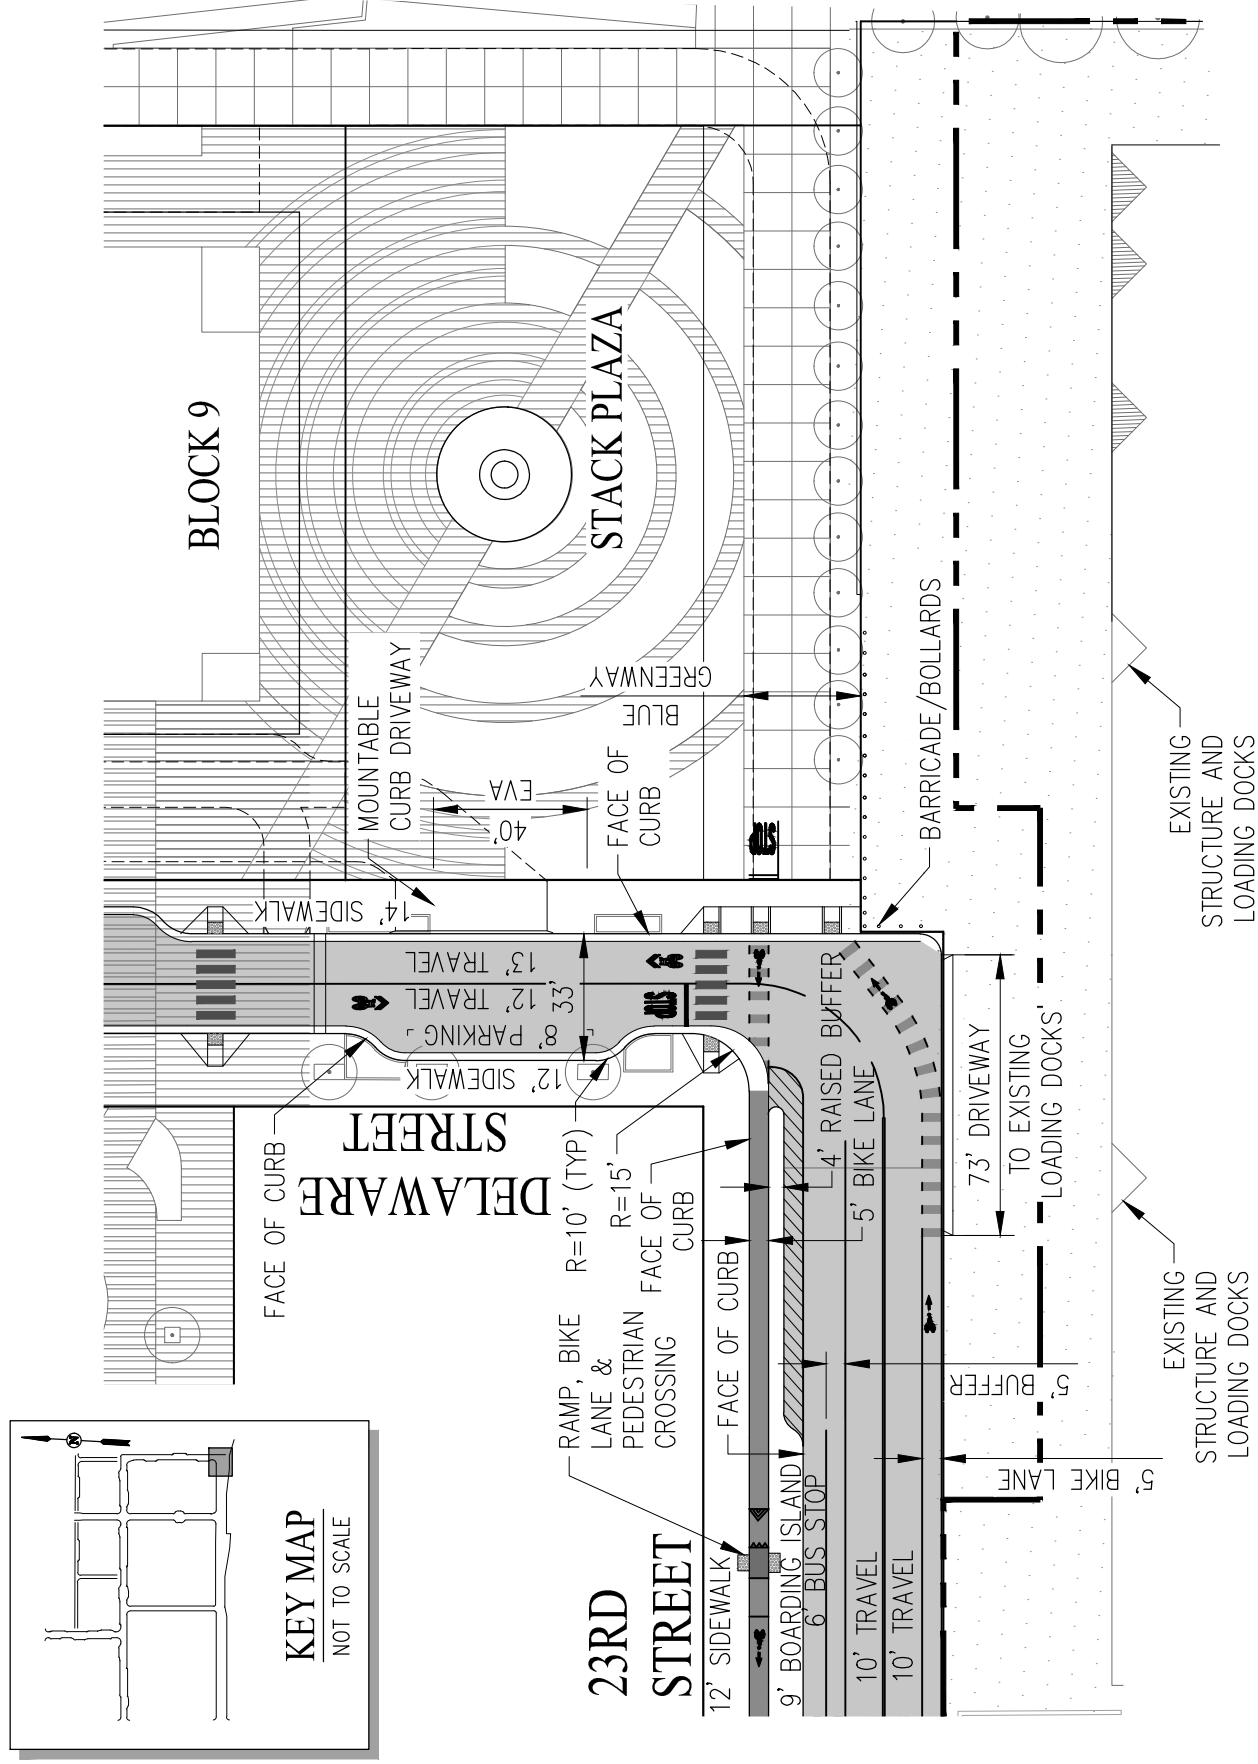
DELAWARE STREET AND 23RD STREET
